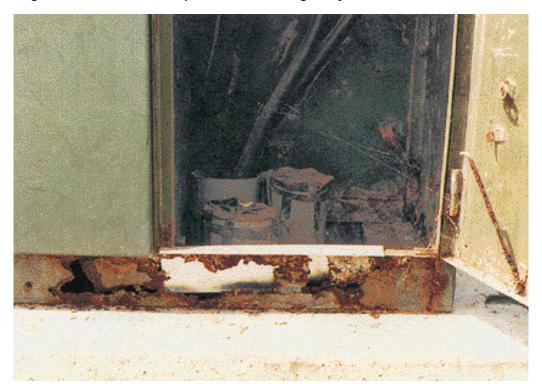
Very Heavy Corrosion of Locking Assembly
